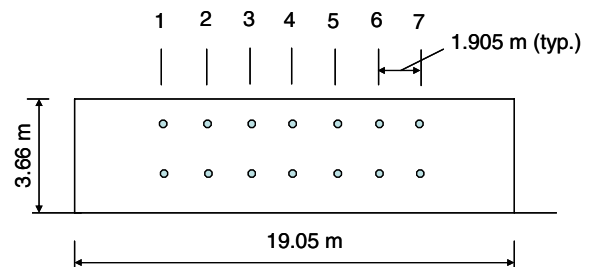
Elevation of 19.05 × 3.66 m building face, and location of taps of interest
